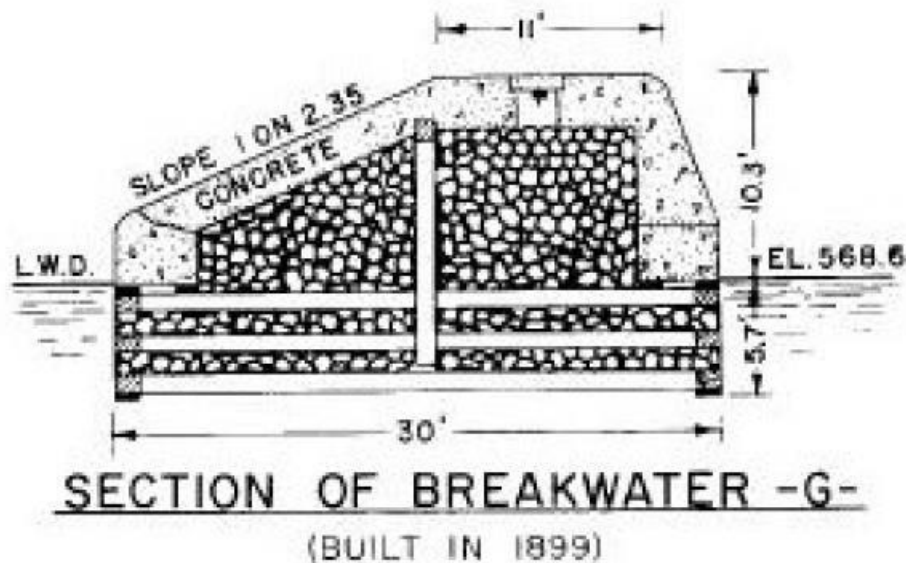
Cross section of existing breakwater showing concrete monolith cap.
